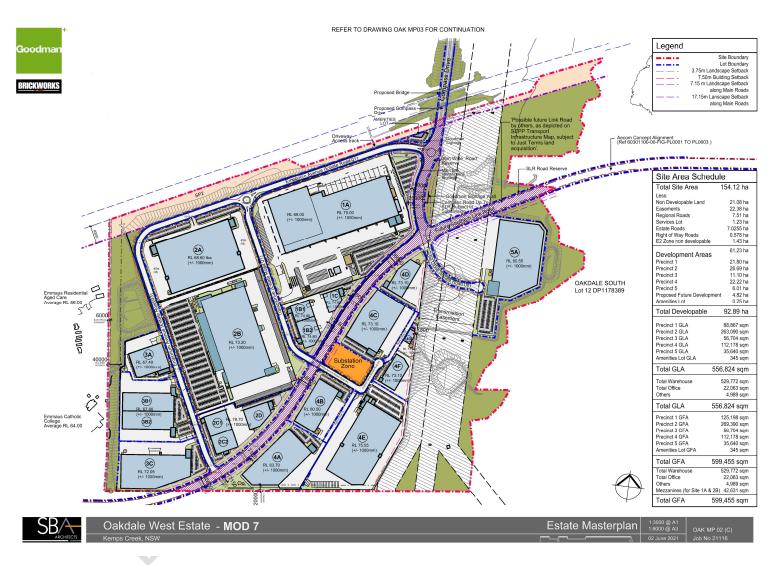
Proposed Masterplan Layout (Source: SBA Architects)
